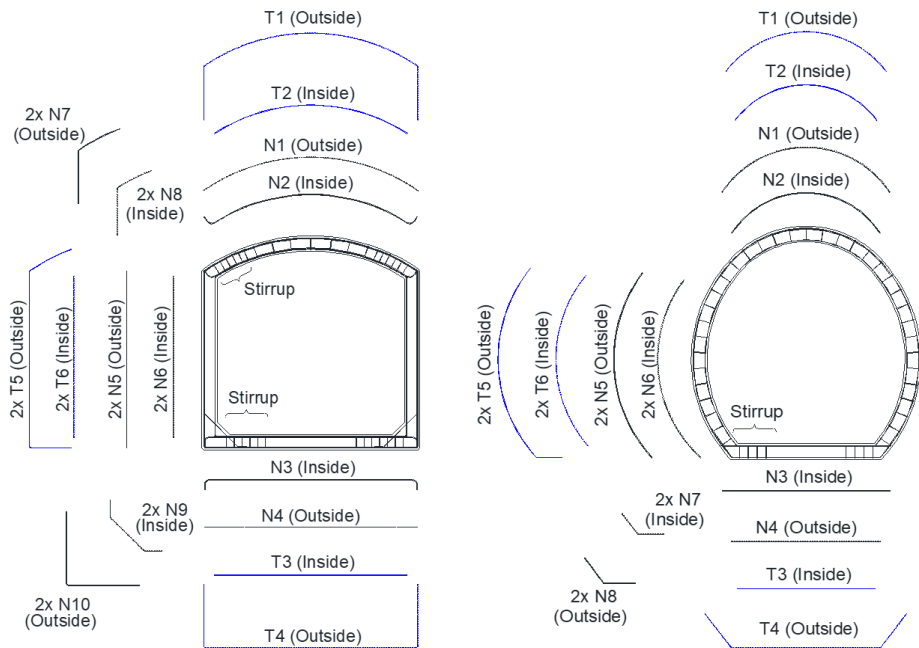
Reinforcement arrangement in culverts modified and defined by three arches.
